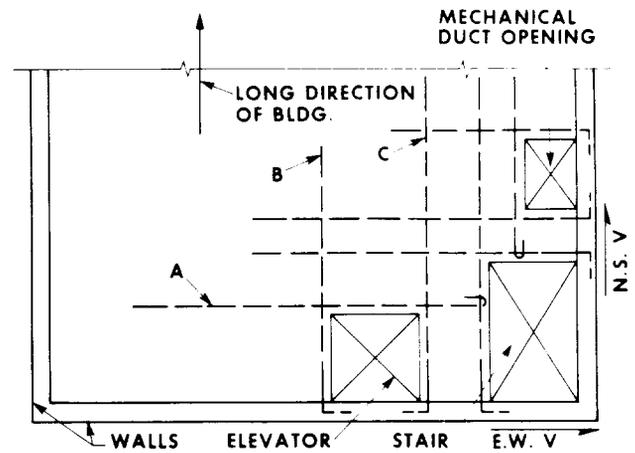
Building Floor Plan Showing Collector Reinforcing Bars A, B, and C
